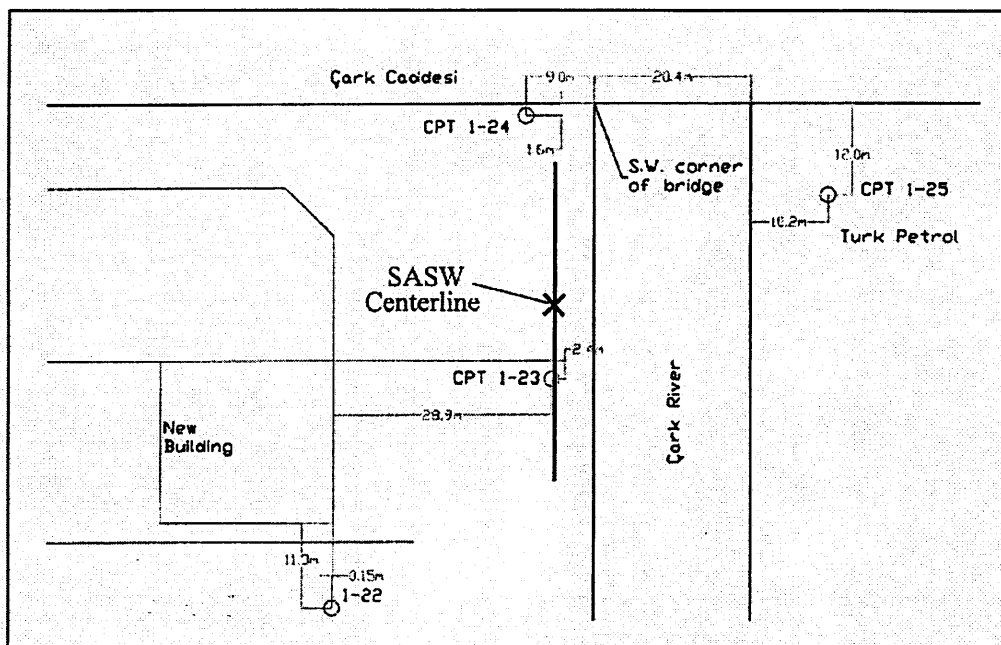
Plan view of Site 1-24 showing the location of one SASW centerline (modified from <http://peer.berkeley.edu/turkey/adapazari>).
